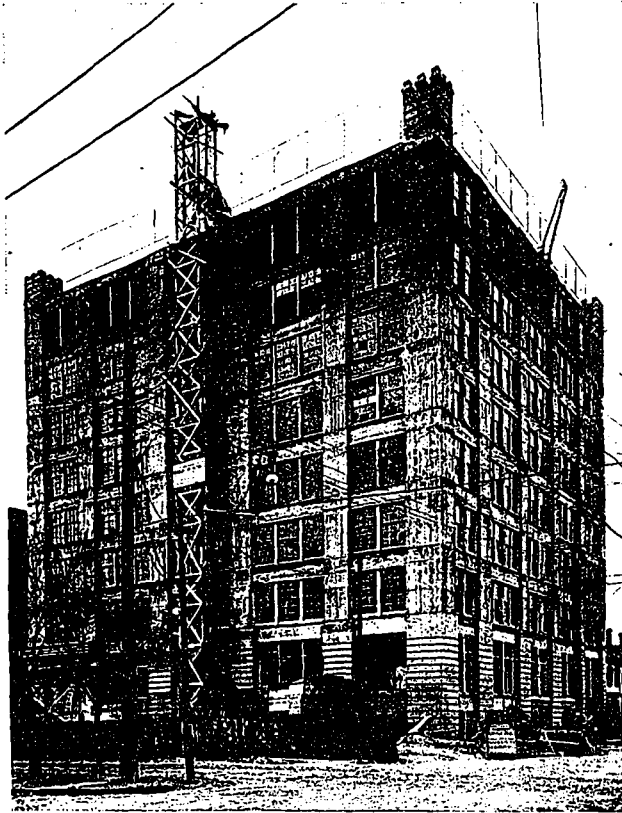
WAREHOUSE LATELY ERECTED BY ANDREW DARLING CO., TORONTO. A GOOD EXAMPLE OF MODERN WAREHOUSE CONSTRUCTION IN REINFORCED CONCRETE. IN PLAN, ARRANGEMENT AND CONSTRUCTION THE STRUCTURE IS ABSOLUTELY FIREPROOF AND IS A MOST CREDIBLE REPRESENTATION OF WHAT MAY BE DONE WITH THIS NEW METHOD OF BUILDING CONSTRUCTION WHICH IS BECOMING SO UNIVERSALLY POPULAR. GORDON & HELLIVELL, TORONTO, ARCHITECTS. TRUSSED CONCRETE STEEL CO., LTD., TORONTO, CONSULTING AND SUPERVISING ENGINEERS.
